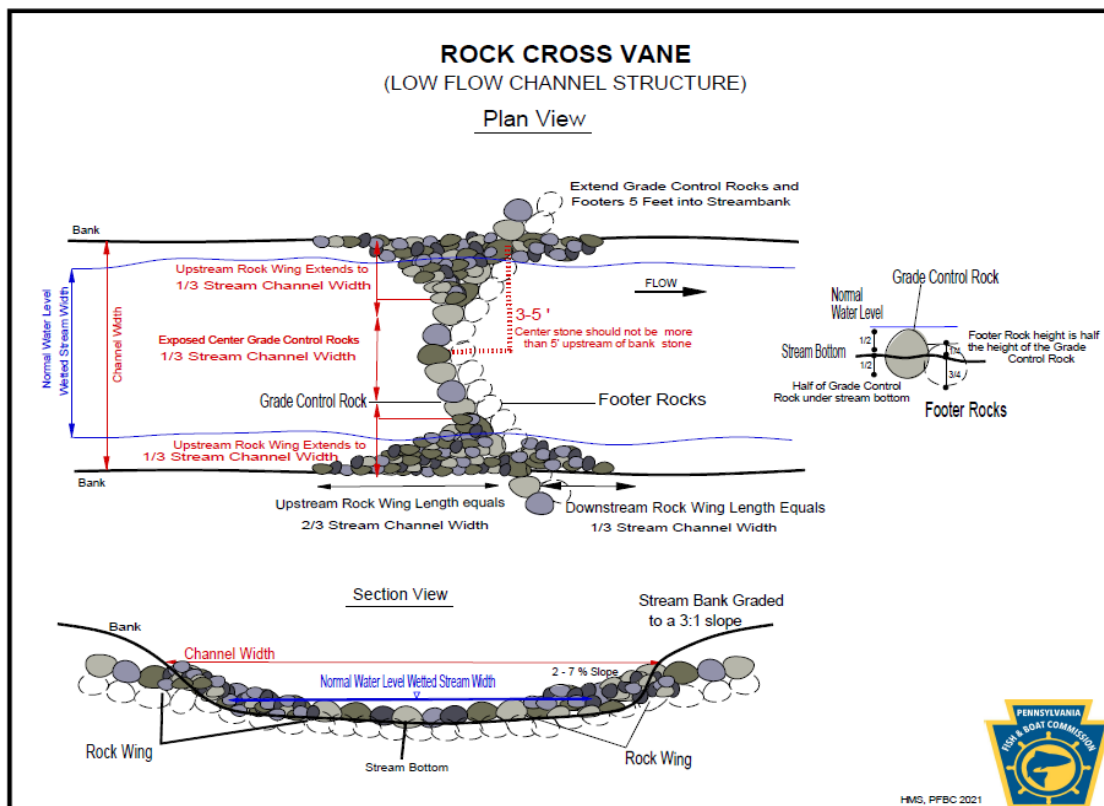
Example rock cross vane plan and section views standard drawing. PA Fish and Boat Commission, 2021. https://www.fishandboat.com/Resource/Documents/habitat_improve_trout.pdf
